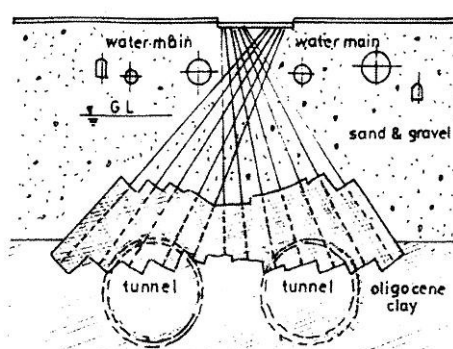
(c) Inclined Array of Grout Holes from Pit
